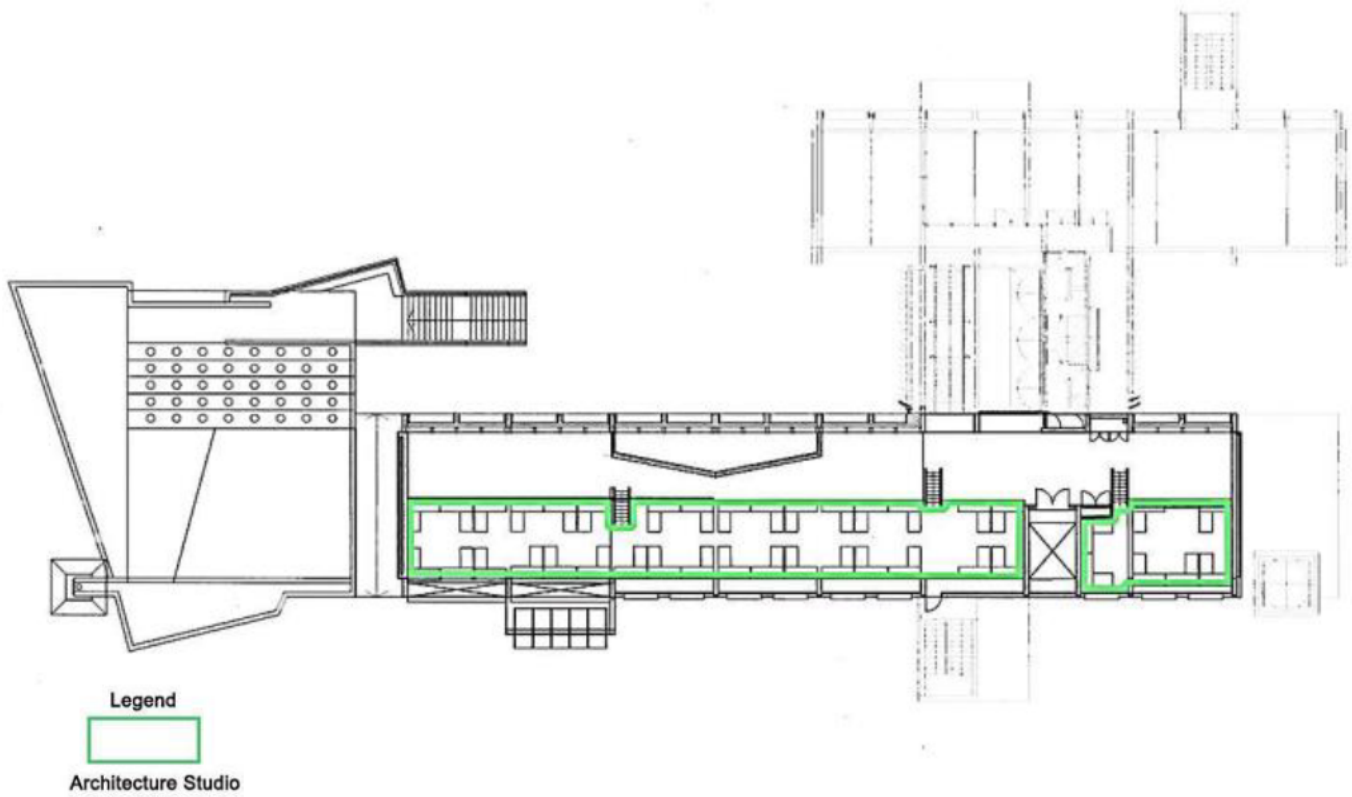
Mezzanine Floor - TUT Department of Architecture, Scale: 1:250 (Luckan 2016)
